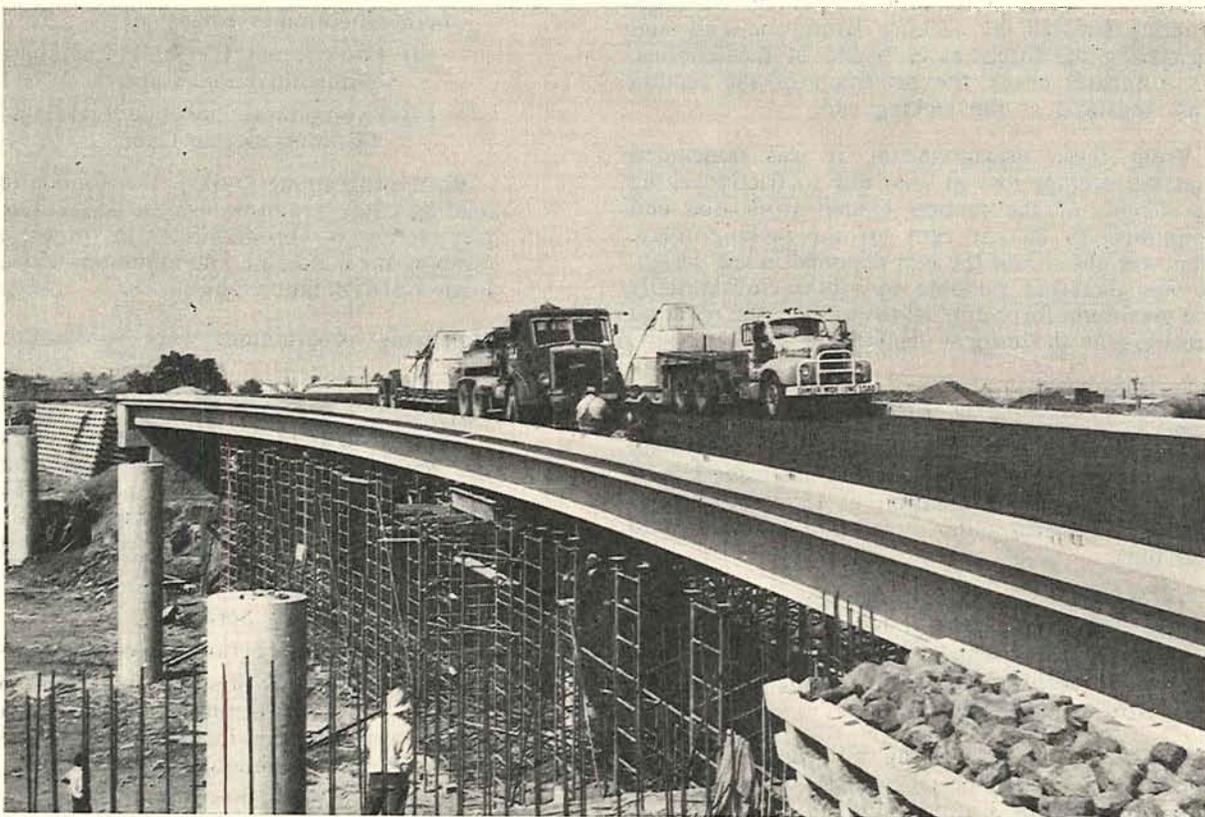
Test loading of the Calder Highway-Lancefield Road Overpass Bridge.
